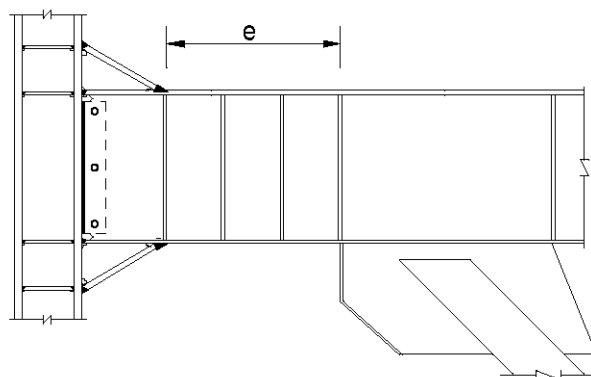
Example of a reinforced link-to-column connection.
